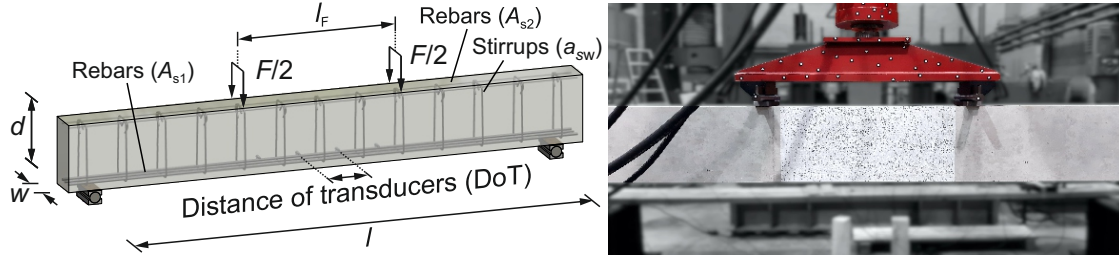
Left: Drawing of the test specimens with dimensions, Right: Photo of test specimen 2 just before the test.
